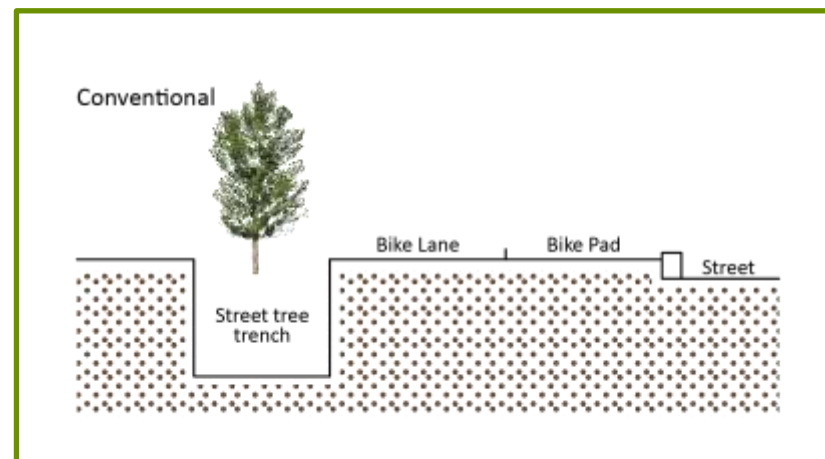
Scenario 1 LCCA Project Plan Cross-Section
